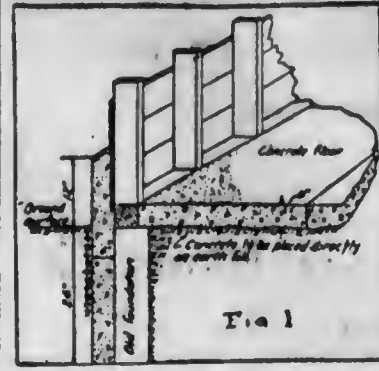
How an Old Foundation May Be Ratproofed and a Concrete Floor Installed.
